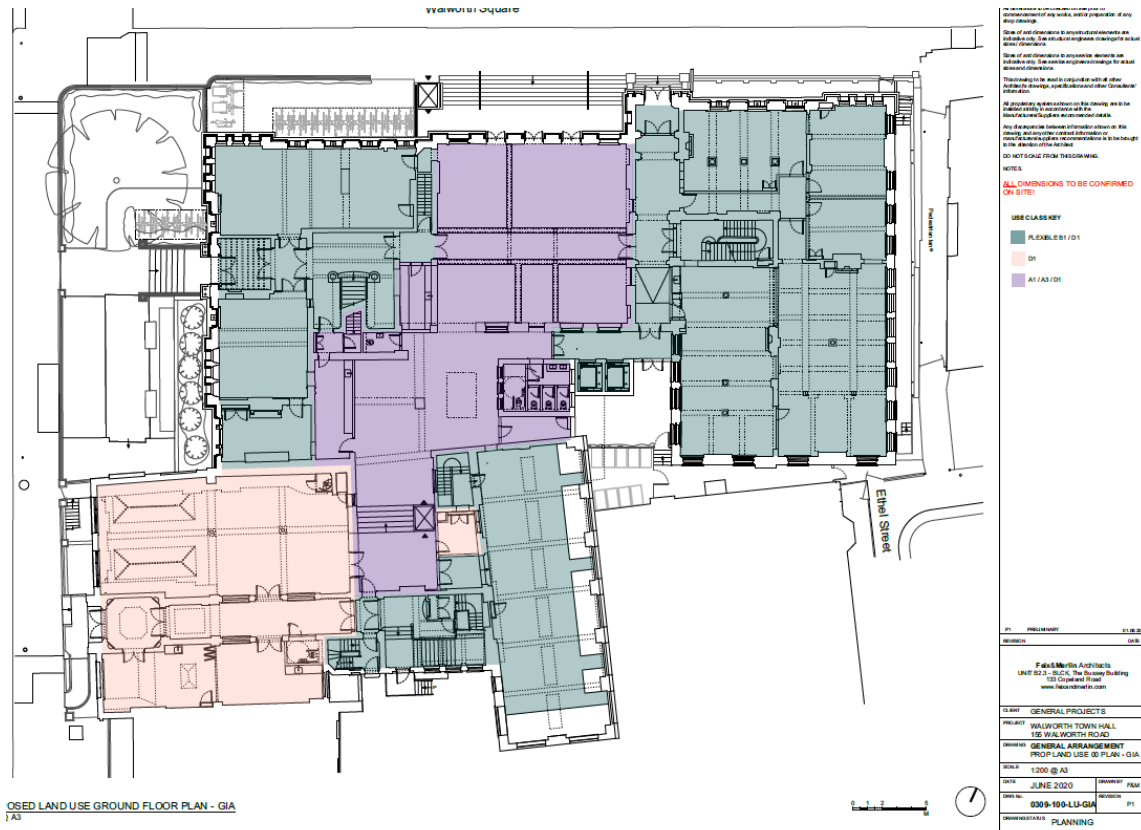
Proposed ground floor plan showing proposed links between the A3/D1 (café – purple) and D1 (community rooms – pink).
